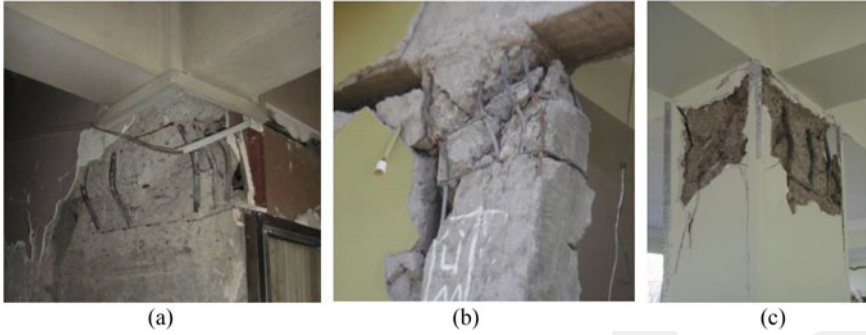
Examples of Type D Damage Category; a flexural damage; b shear damage; c buckling of reinforcement and core crushing
